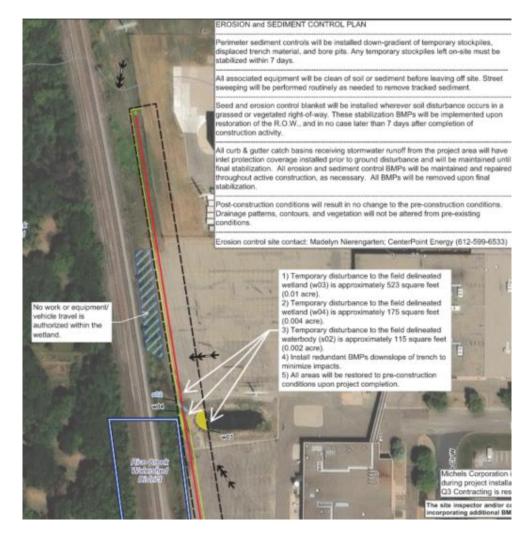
Site plan, Erosion and Sediment Control Plan, and Wetland impacts.
